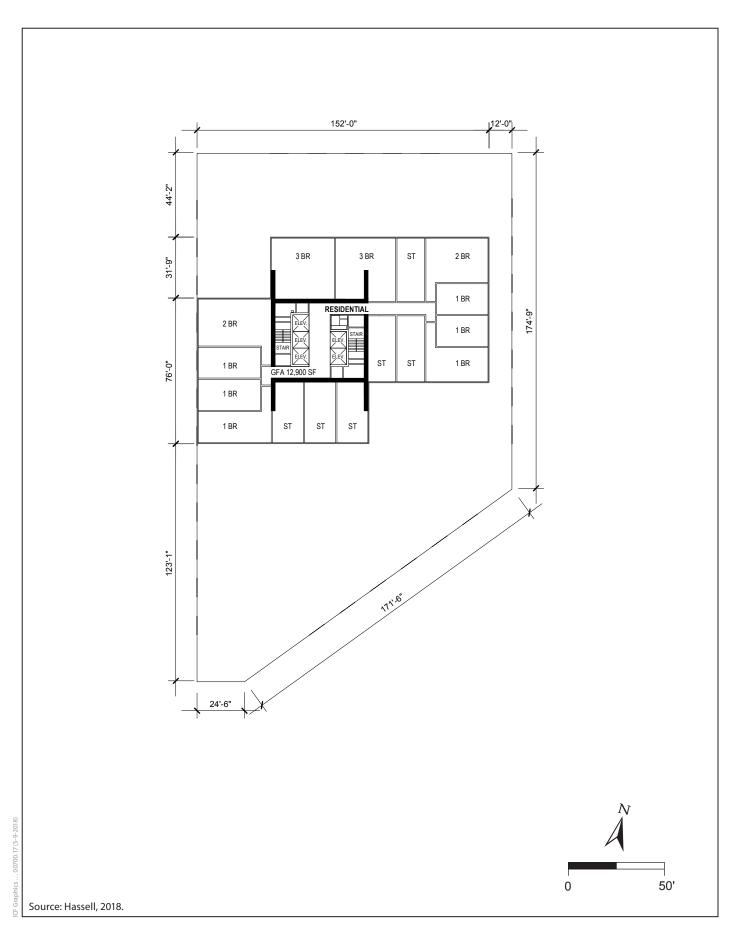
30 Van Ness Avenue Project – Proposed Levels 2-8 Plan
